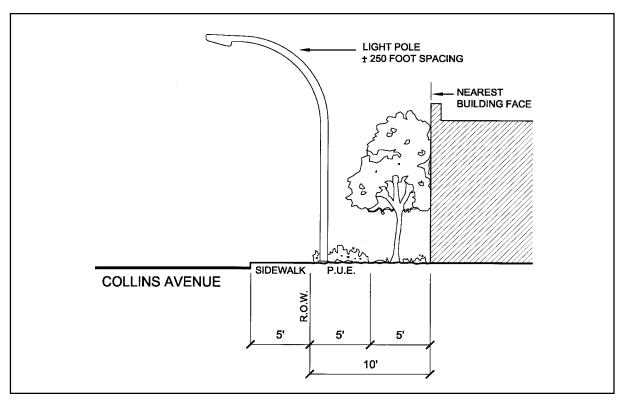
Urban Street Standard, Collins Avenue
